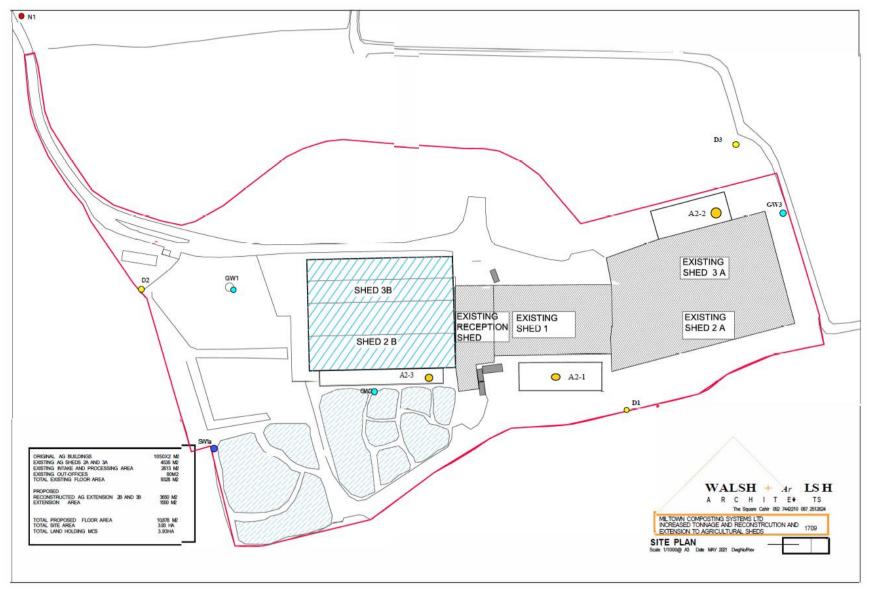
Proposed Site Layout including Shed 2B Shed 3B and Proposed New Biofilter A2-3
